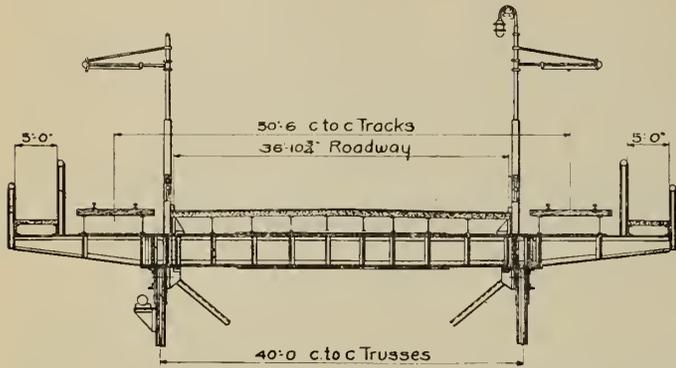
Typical Cross-section of Floor on Approach Spans.
